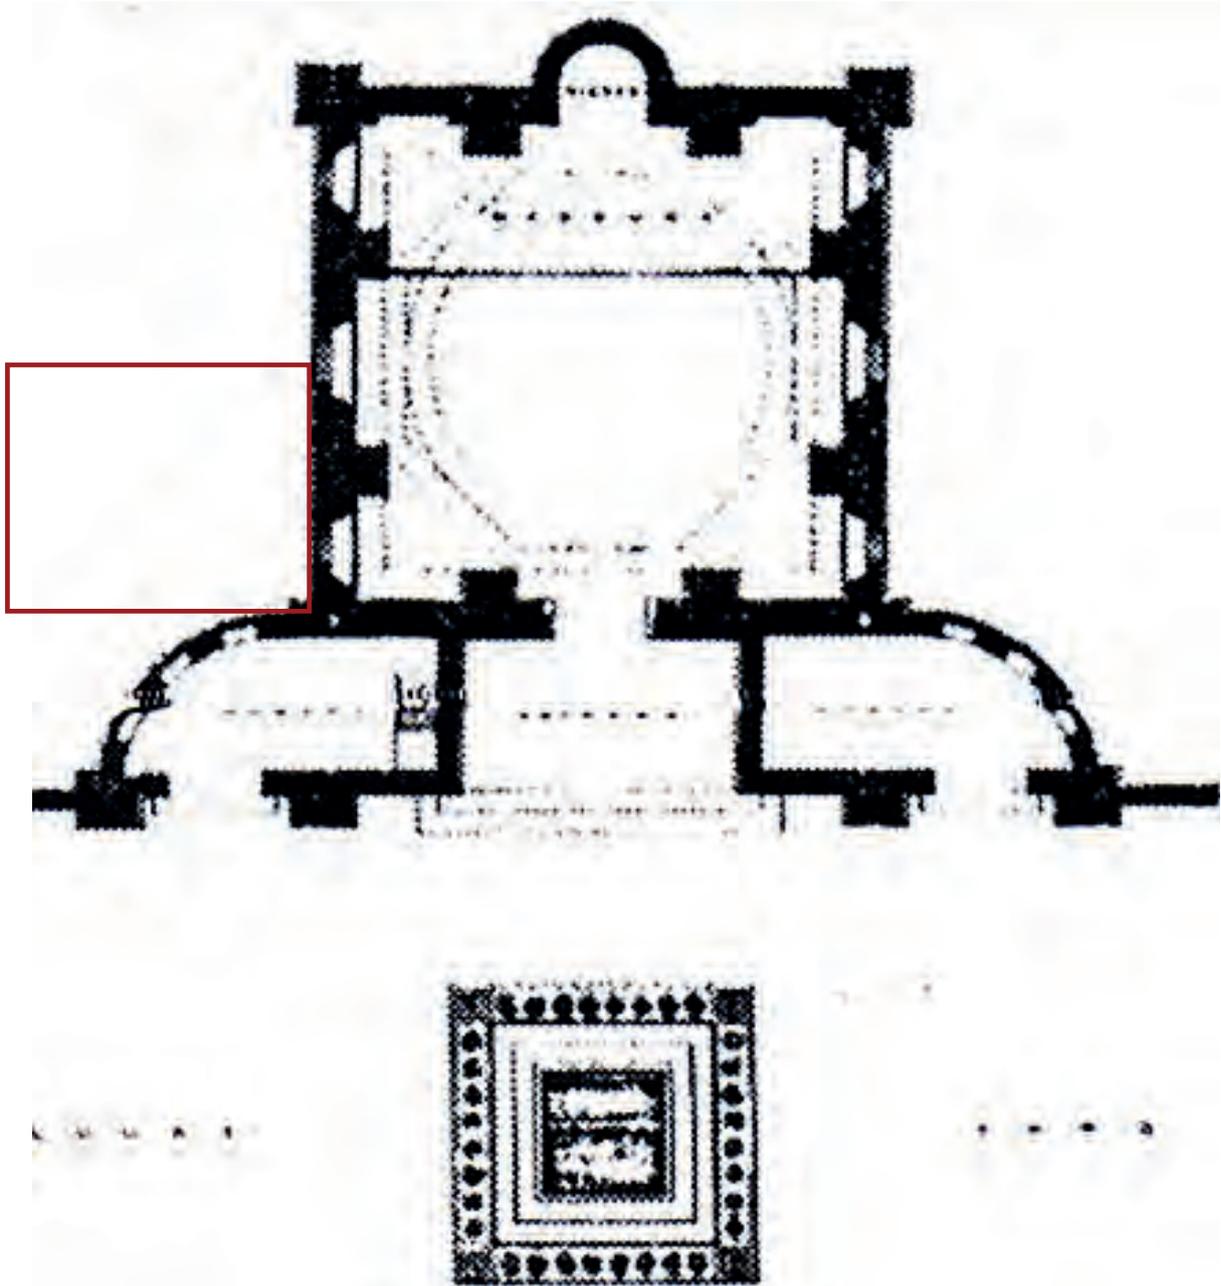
Plan of Woking mosque - additional read bounding box indicating contemporary extension to the original plan
